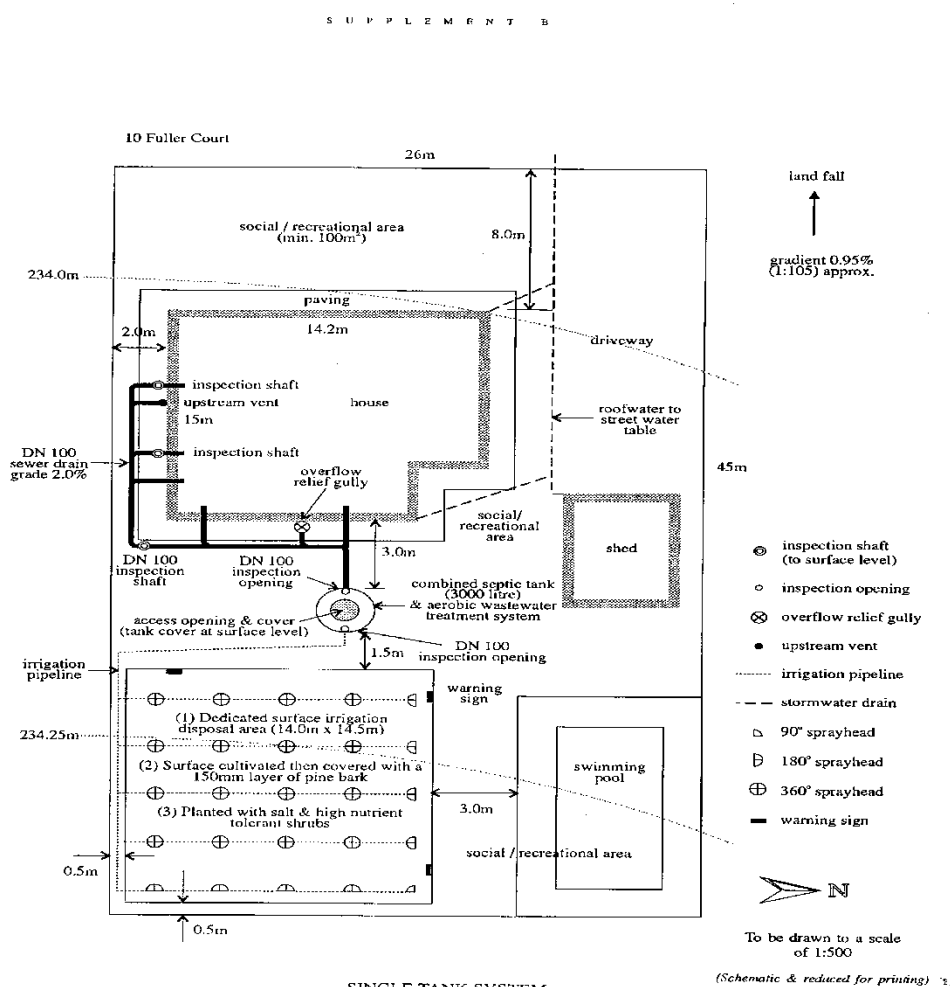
TYPICAL SITE LAYOUT PLAN
